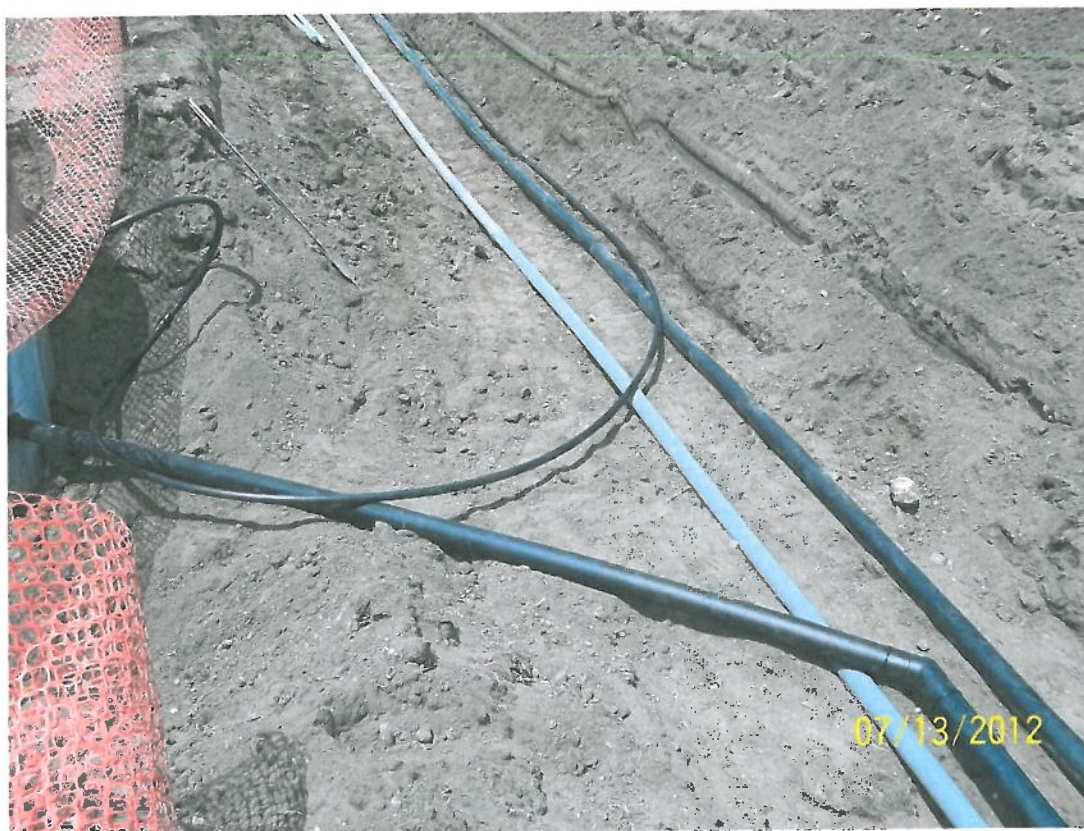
▲ - Typical HDPE pipe butt fusion weld facing south
